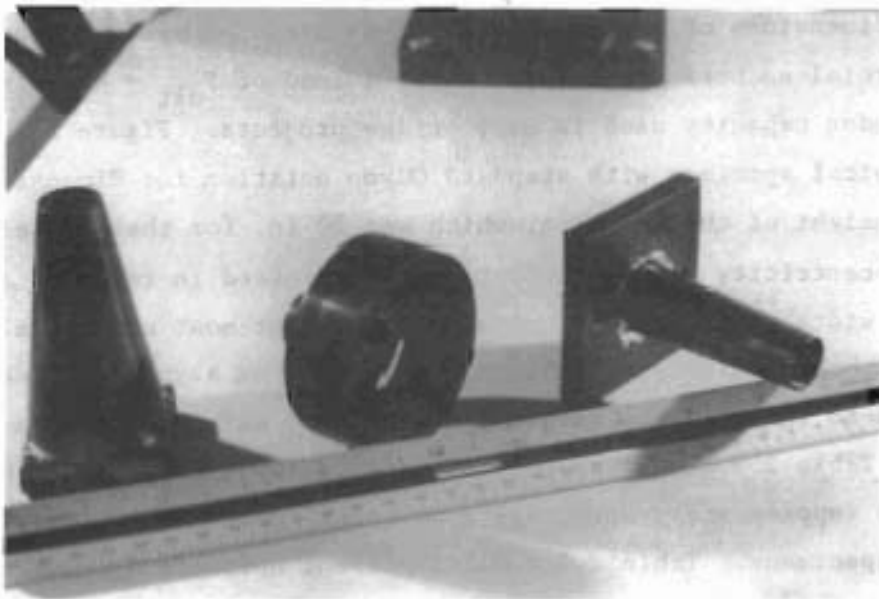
Models of typical anchors used in post-tensioned construction
